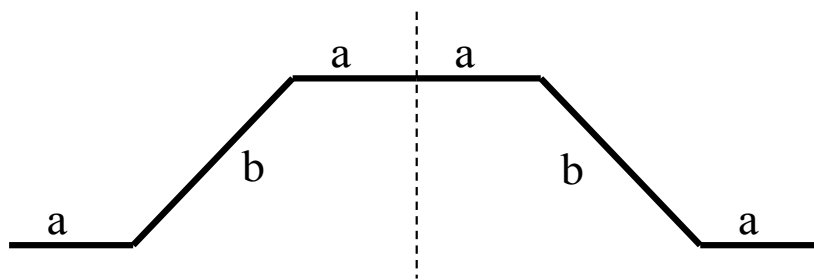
Diagram of an AZ 19-700 Style Sheet Pile Pair
